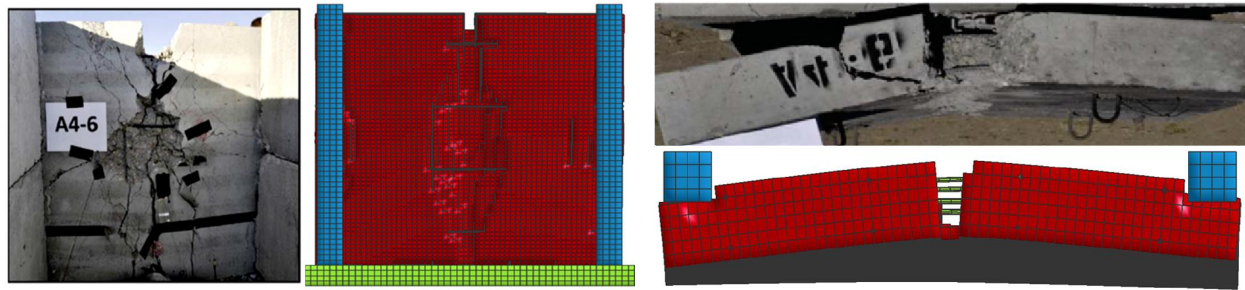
Experimental and numerically predicted damage shape in elevation and plan view
